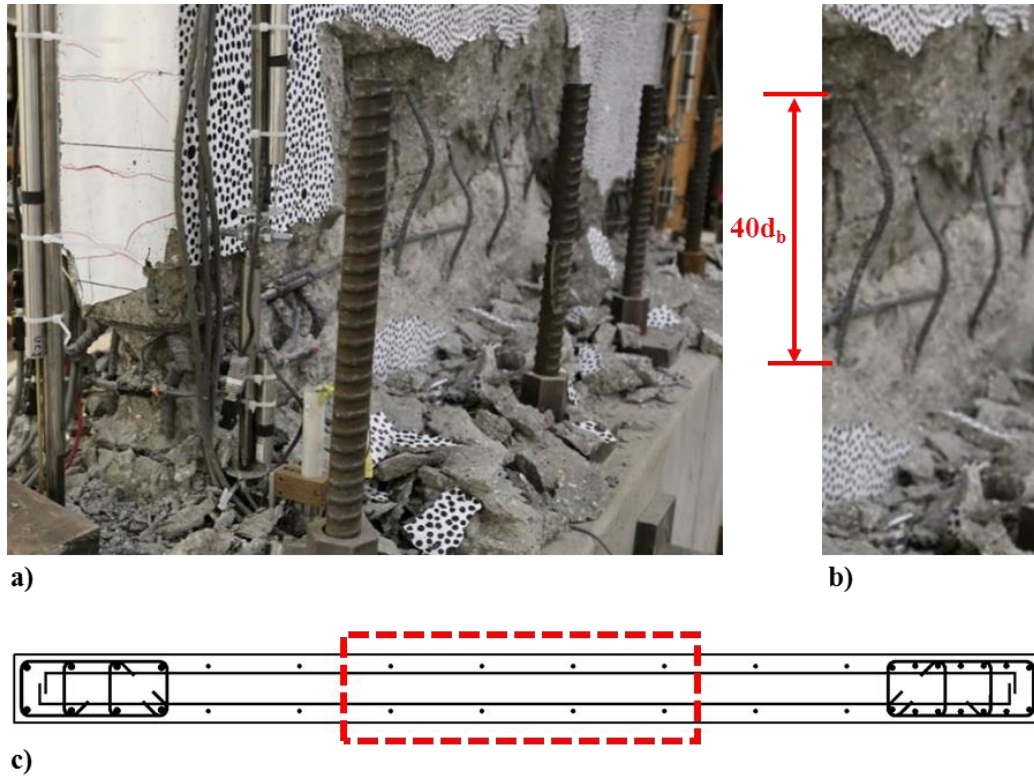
Specimen WP3 web damage – a) Crushing of concrete and buckling of longitudinal reinforcement (after test); b) Close up of web longitudinal reinforcement buckling; and c) WP3 web detail (WEB-1) with longitudinal reinforcement placed outside of transverse reinforcement
